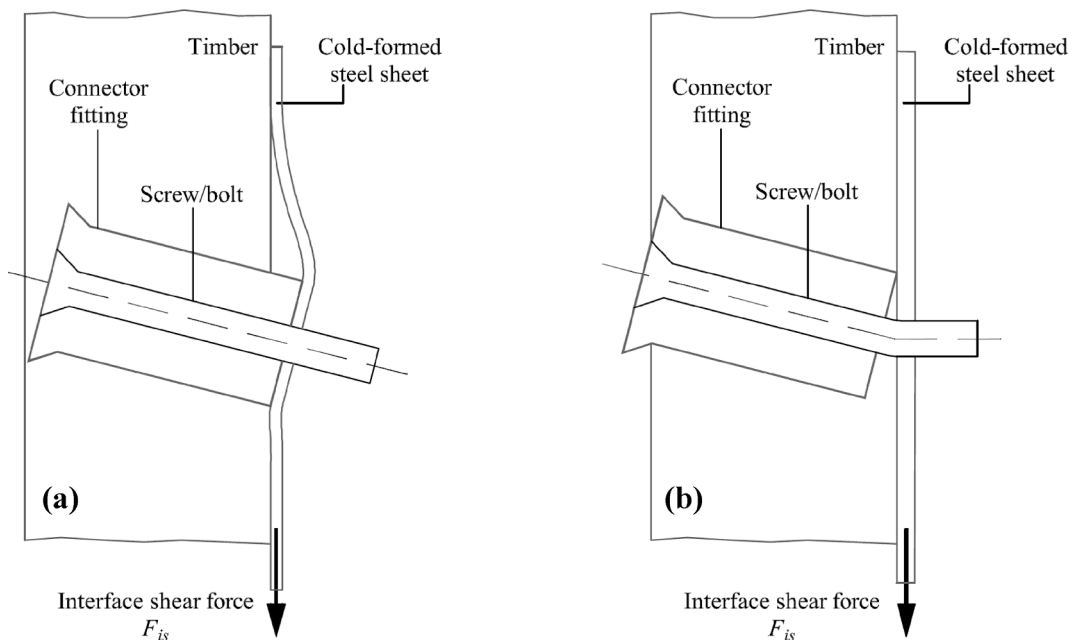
(a) Rotation of the fitting due to CFS sheet bending, (b) Rotation of the fitting due to screw/bolt bending.
